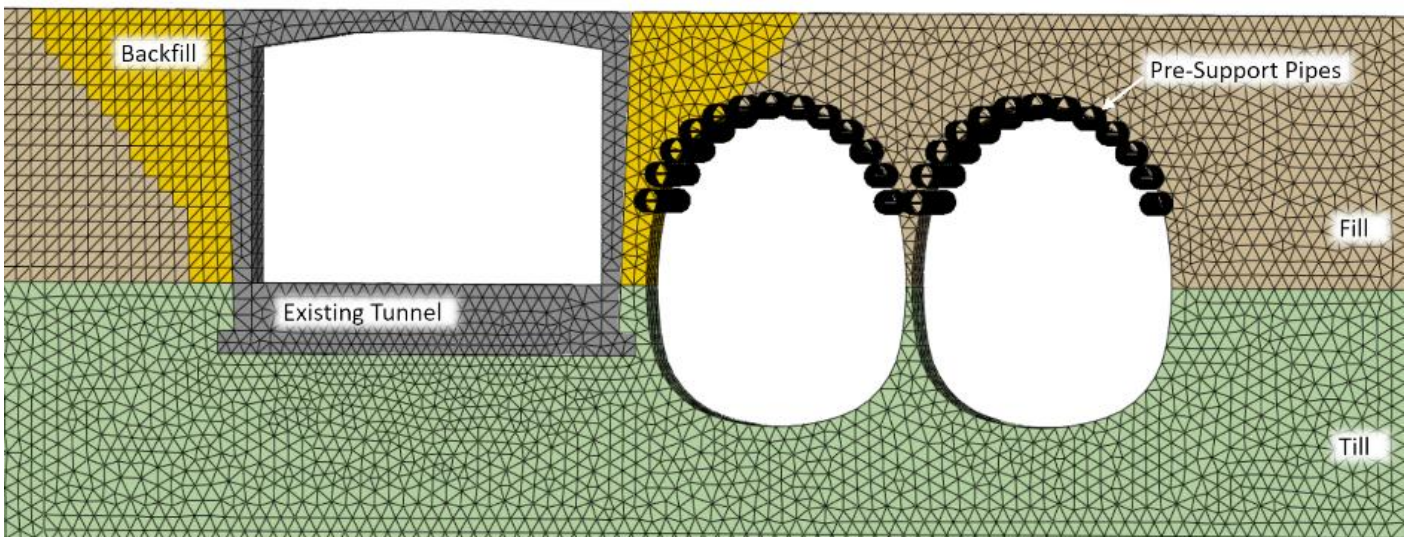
Numerical analysis section indicating the new tunnels with the pre-support pipes, the existing tunnel and the main soil units.
